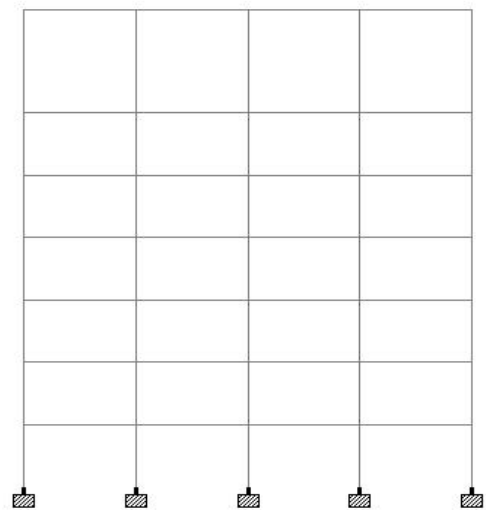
elevation view of building with soft story at top in STAAD.Pro
